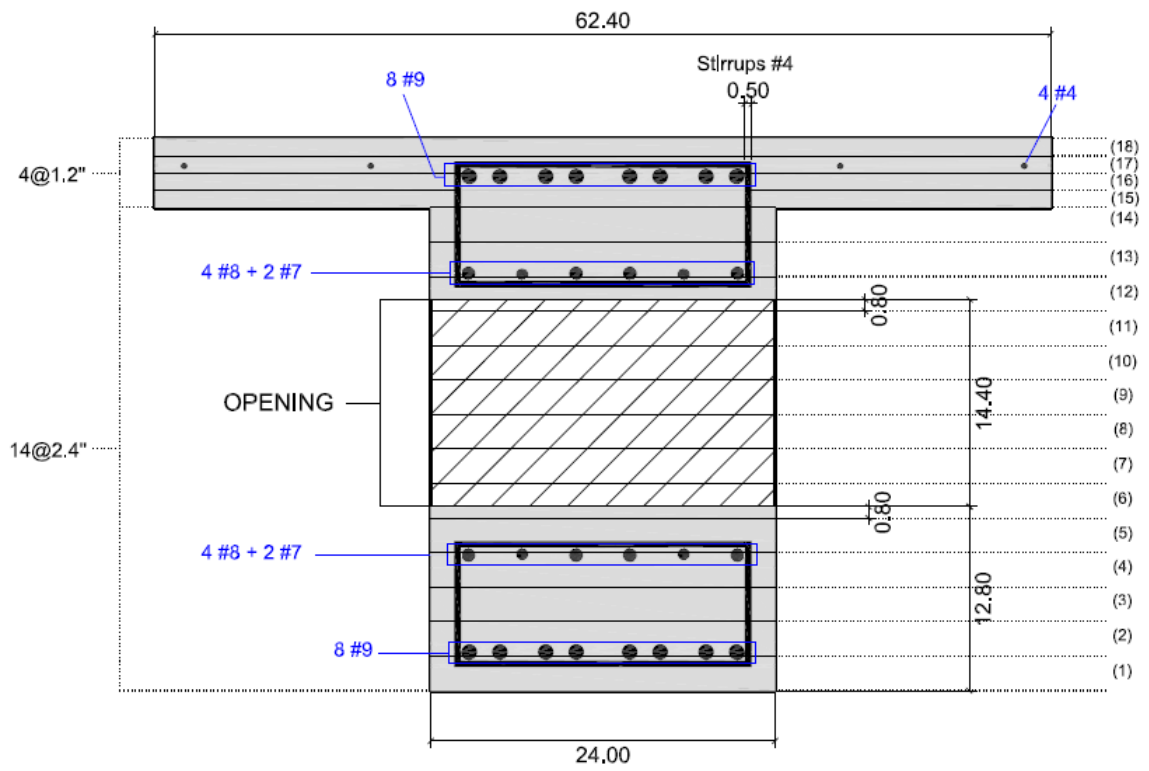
Cross section 6 for Specimen 1. Dimensions in inches.
